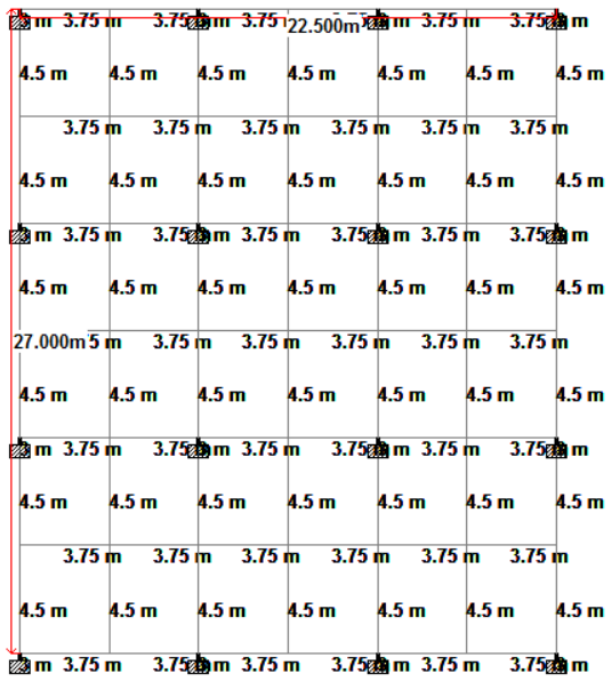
Plan area (22.5m\*27m) with point load M-IV
